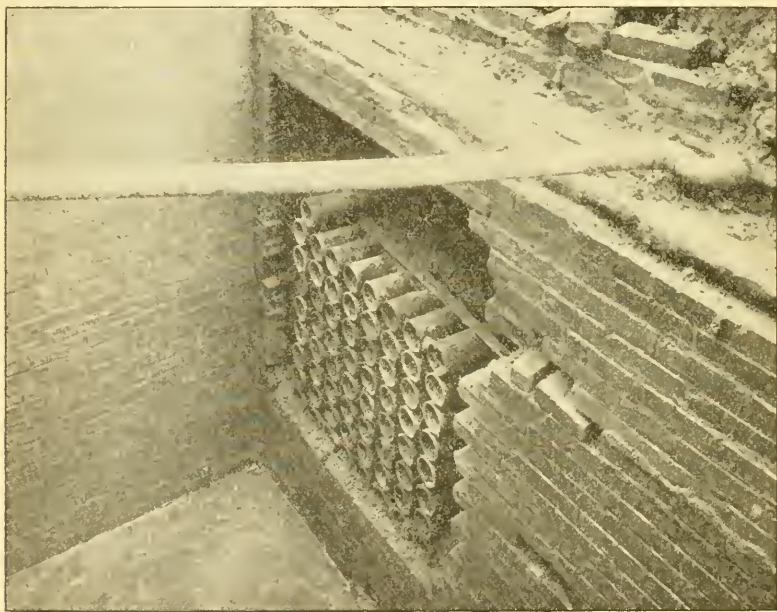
MANHOLE OF UNDERGROUND SYSTEM SHOWING DUCTS DURING CONSTRUCTION.
